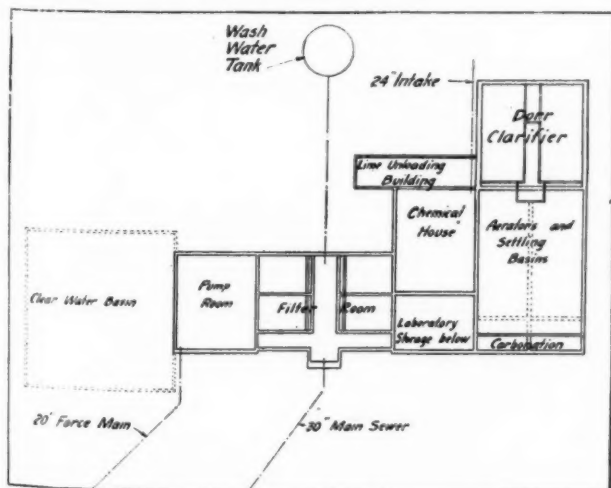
GENERAL PLAN OF PIQUA WATER PURIFICATION AND SOFTENING PLANT
